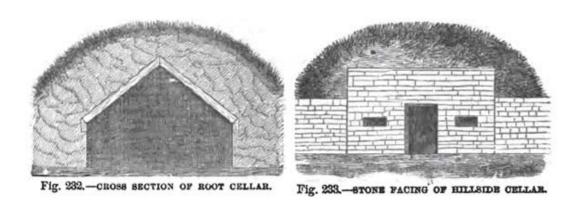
Section and elevation of a root cellar, from Byron D. Halsted, <u>Barn Plans and Outbuildings (New York: Orange Judd Co, 1898)</u>, 224-25.
